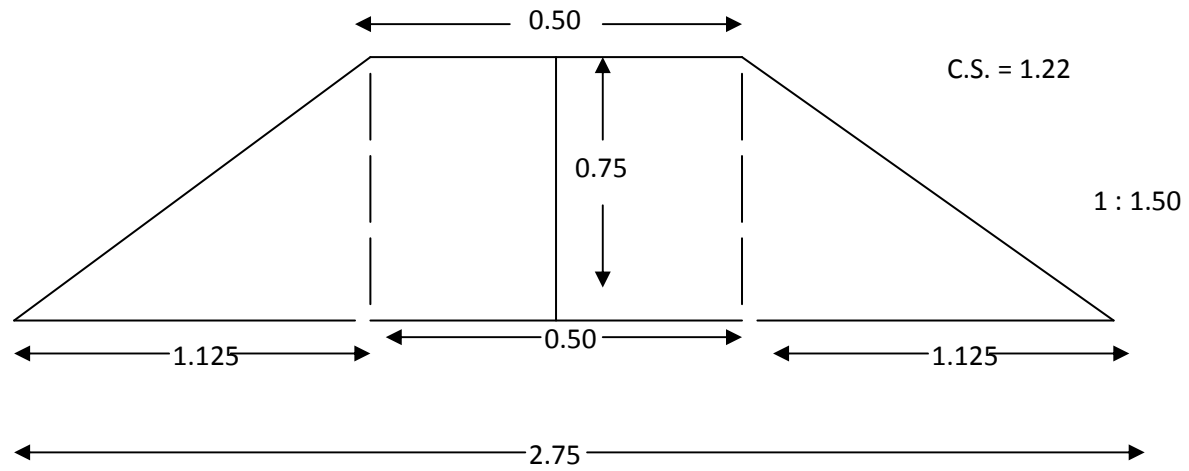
Field Bunds: Cross Section – 1.22 (Not to Scale)
